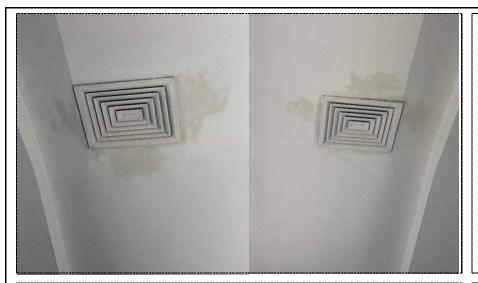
Water staining around diffusers in Media roombuilding 1.
